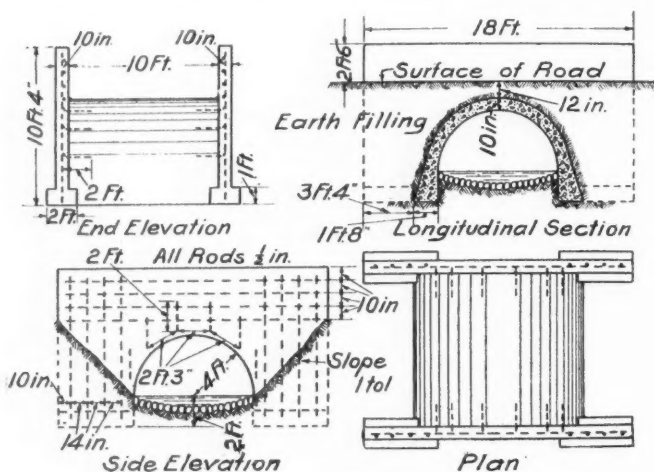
ARCH CULVERT FOR EIGHT-FOOT SPAN
